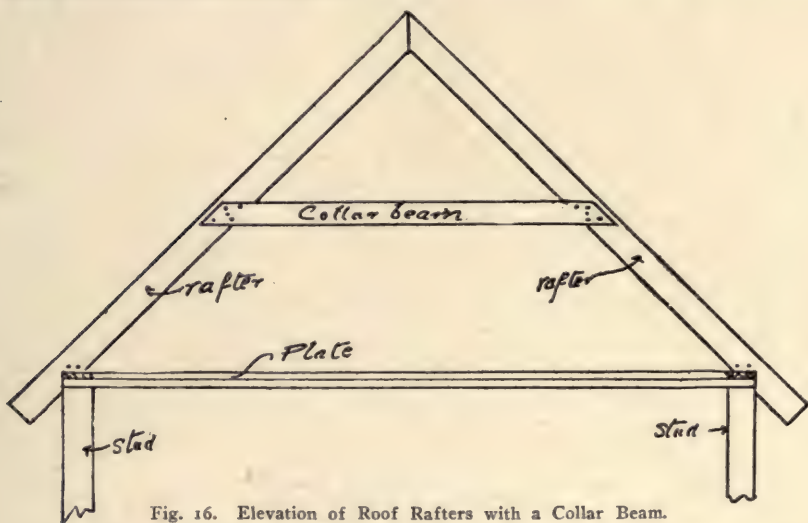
Elevation of Roof Rafters with a Collar Beam.
